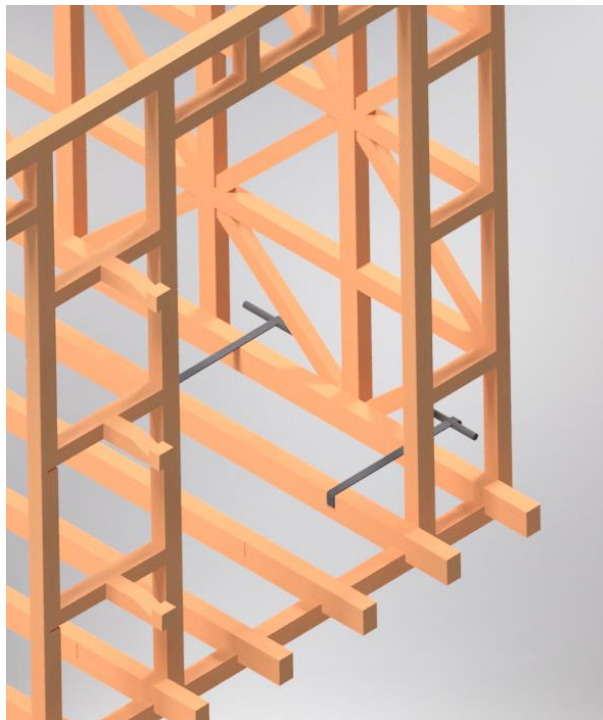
Pavement timber beams fixed to the masonry walls with iron anchorages – schematic representation (Adapted from (Mascarenhas, 2004))
